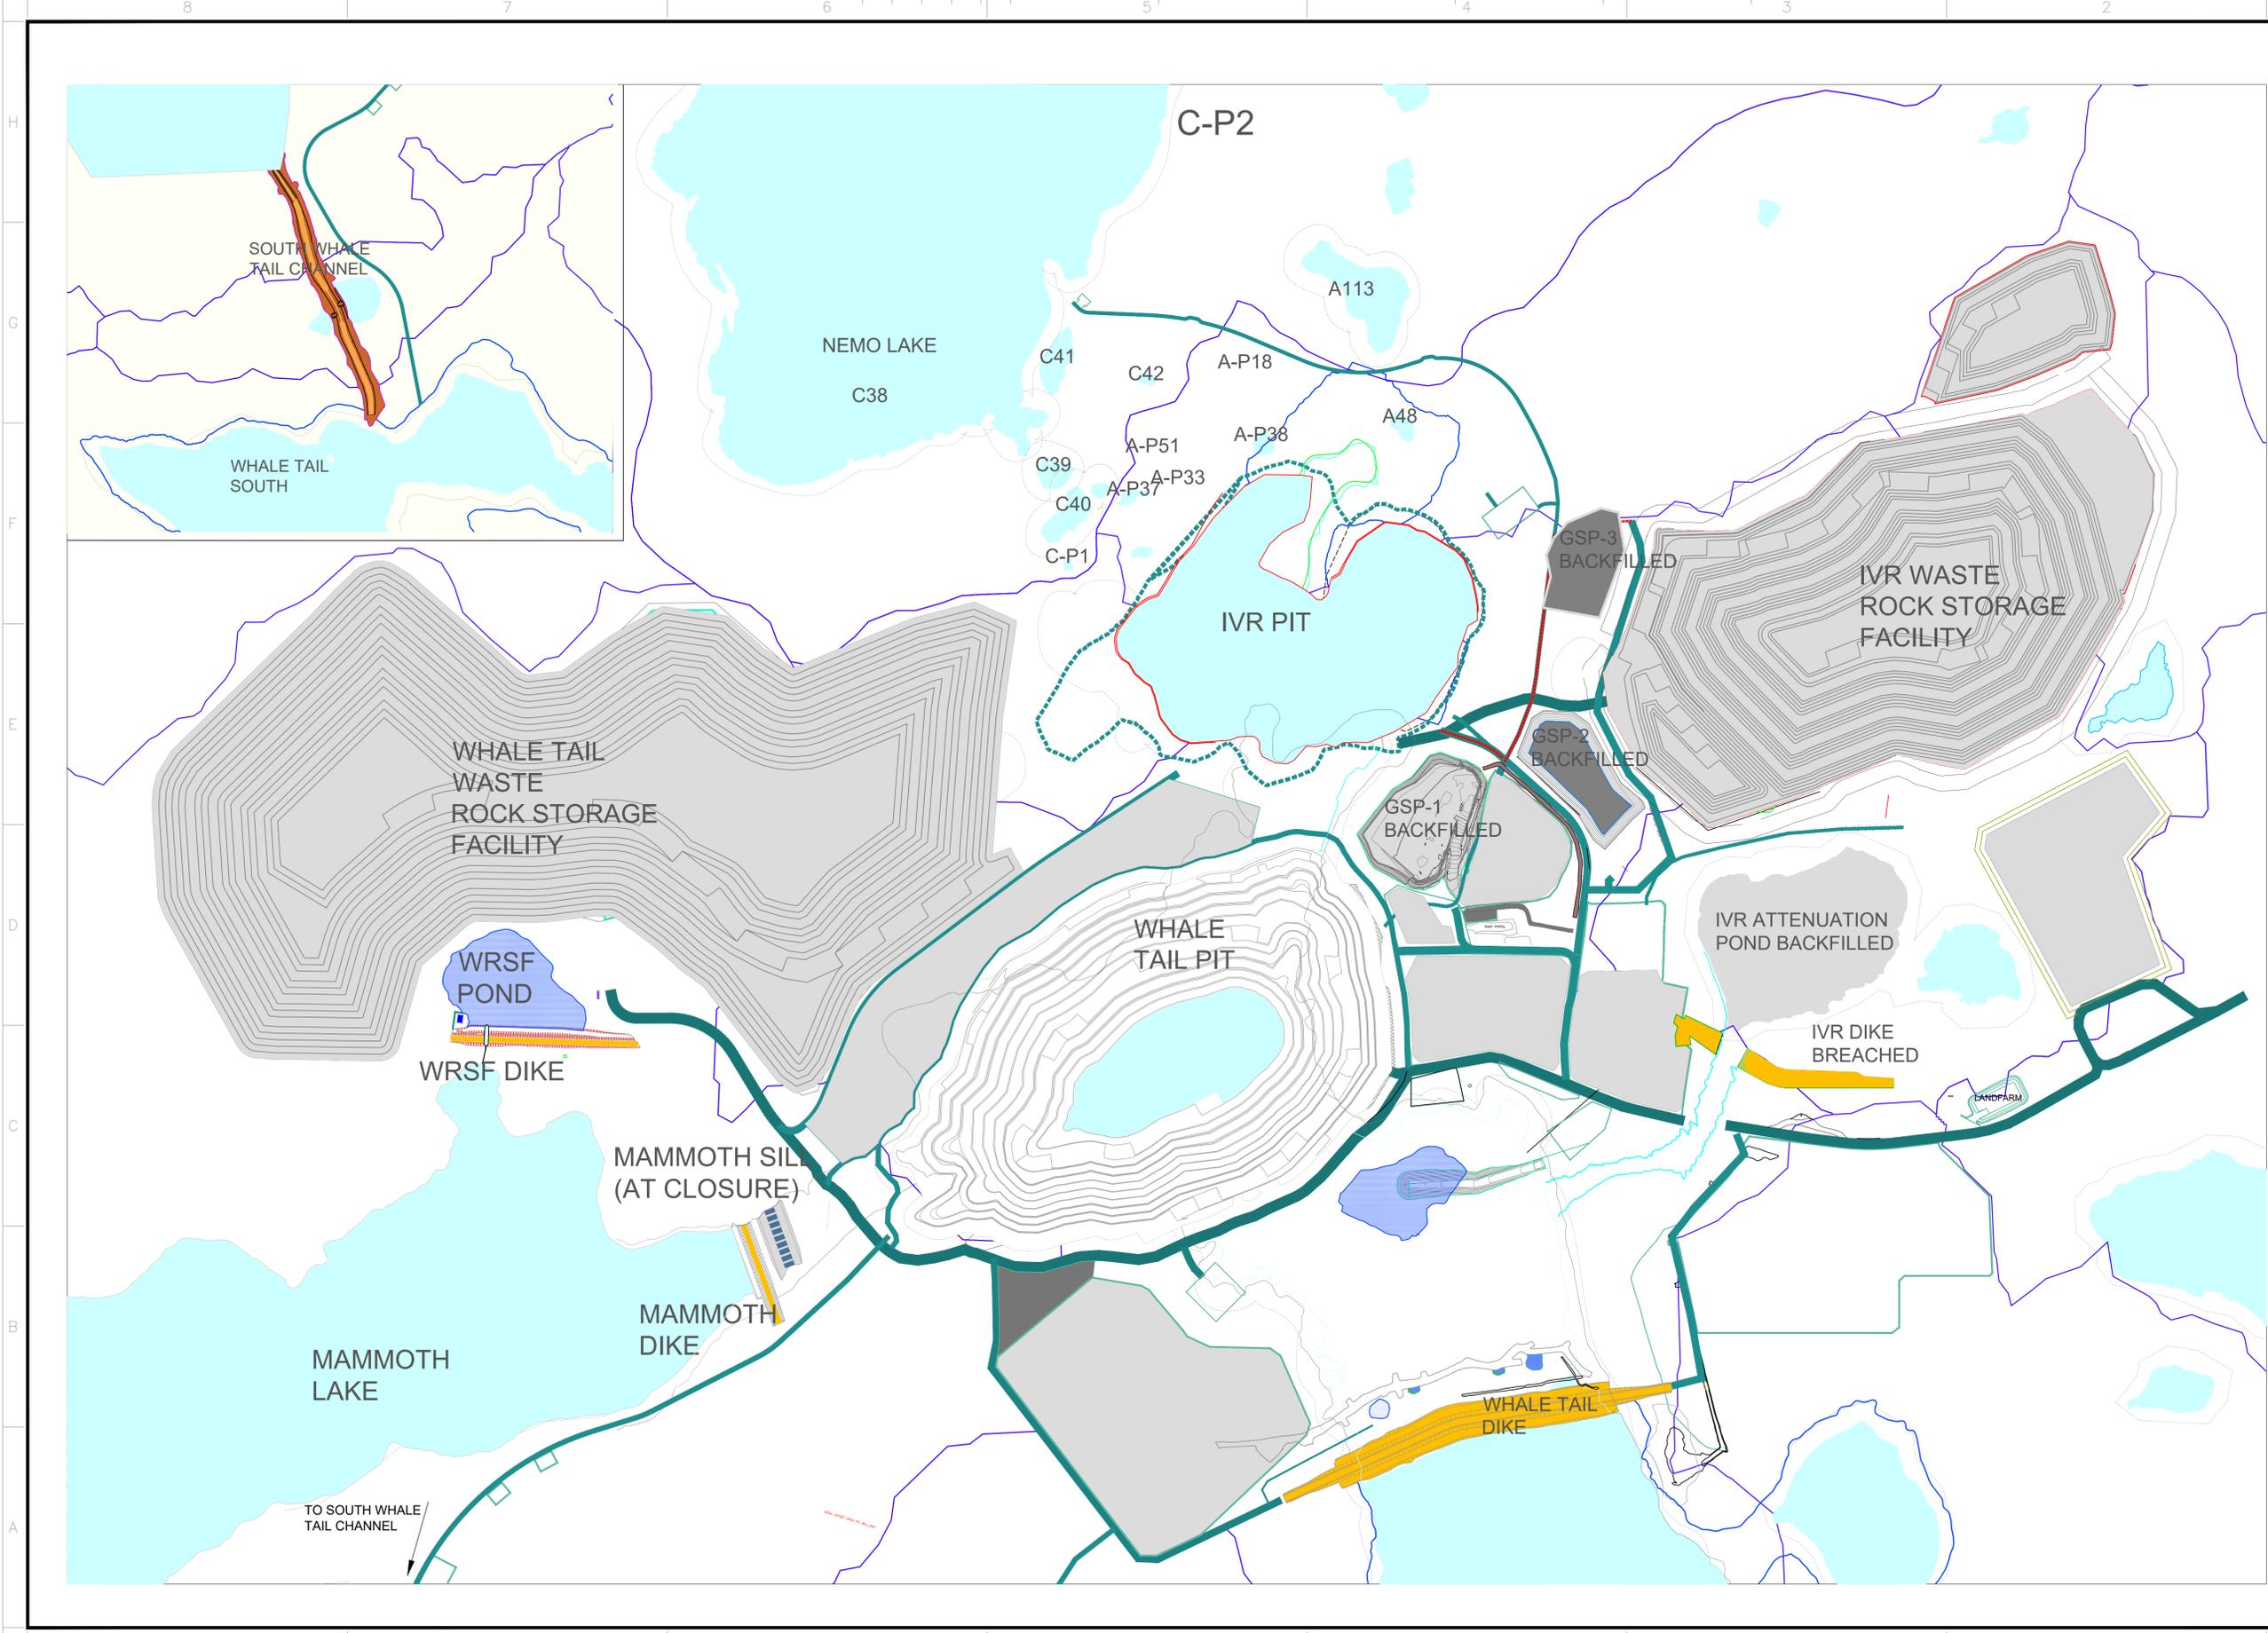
Yearly Site Layout Plan (Year 2020-2025) – Whale Tail Project Expansion
